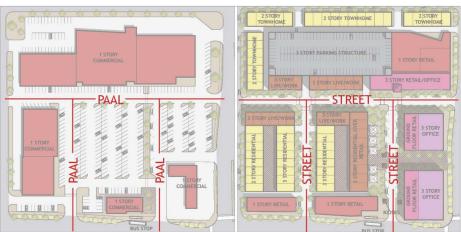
c.: Illustration showing the conversion of a main parking aisles and walkway connections into new streets within a shopping center redevelopment.
